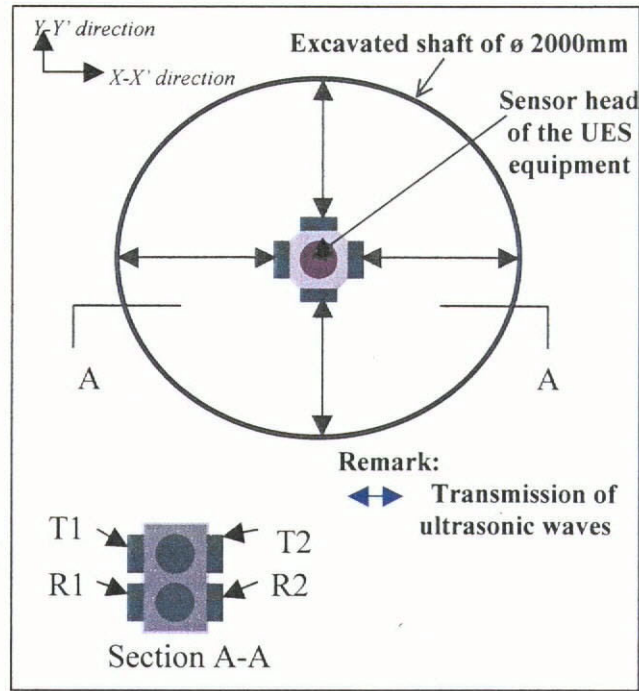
Schematic drawing showing the sensor head of the UES equipment
